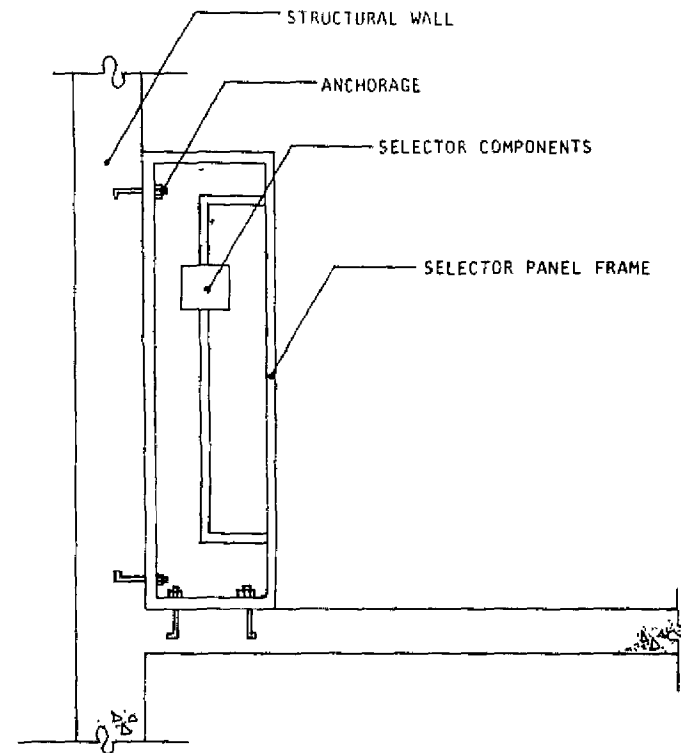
Elevator systems. Installation of elevator selector panel
